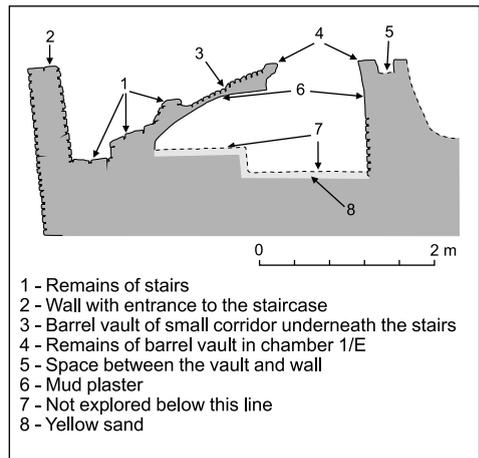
Section through the staircase (marked AB in Fig. 1) (Drawing M. Drzewiecki)
